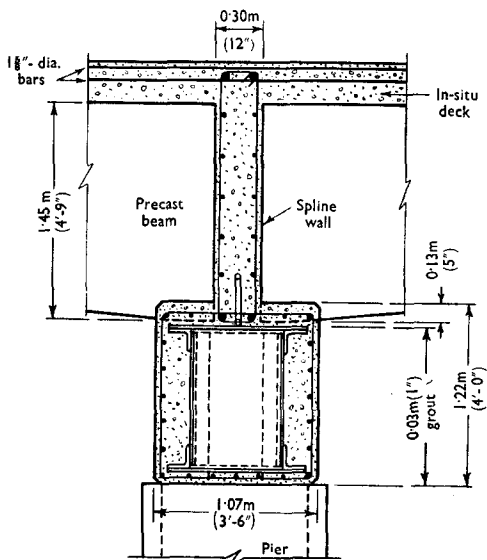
SECTION THROUGH CROSS-BEAM AND SPLINE WALL
